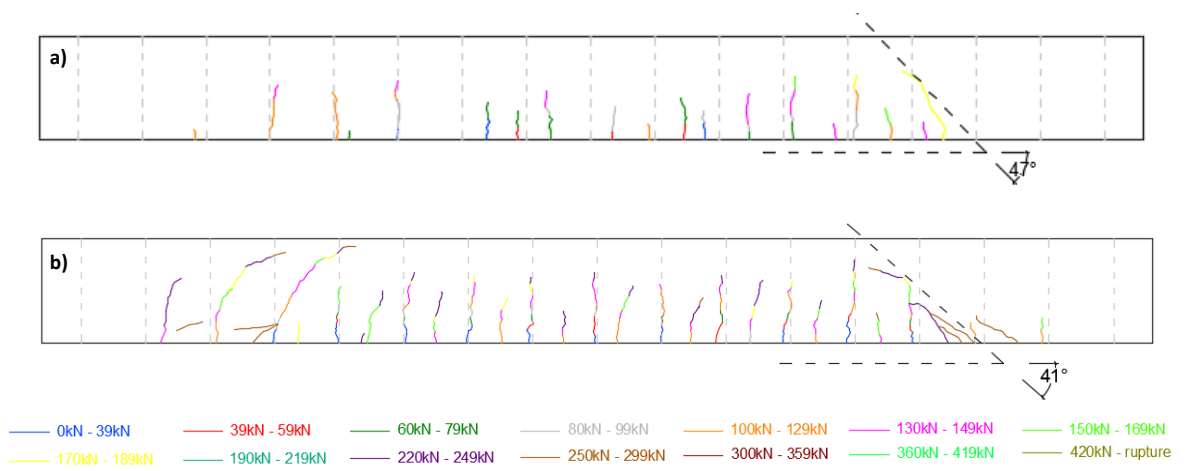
Cracking pattern of: a) BB250; b) BDHB250
